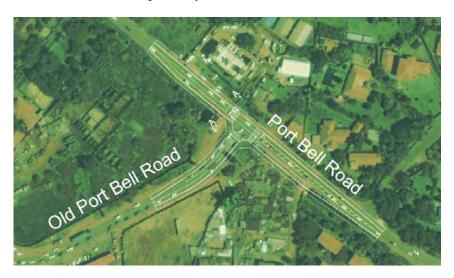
Proposed Alignment and Configuration of Junction Improvement
